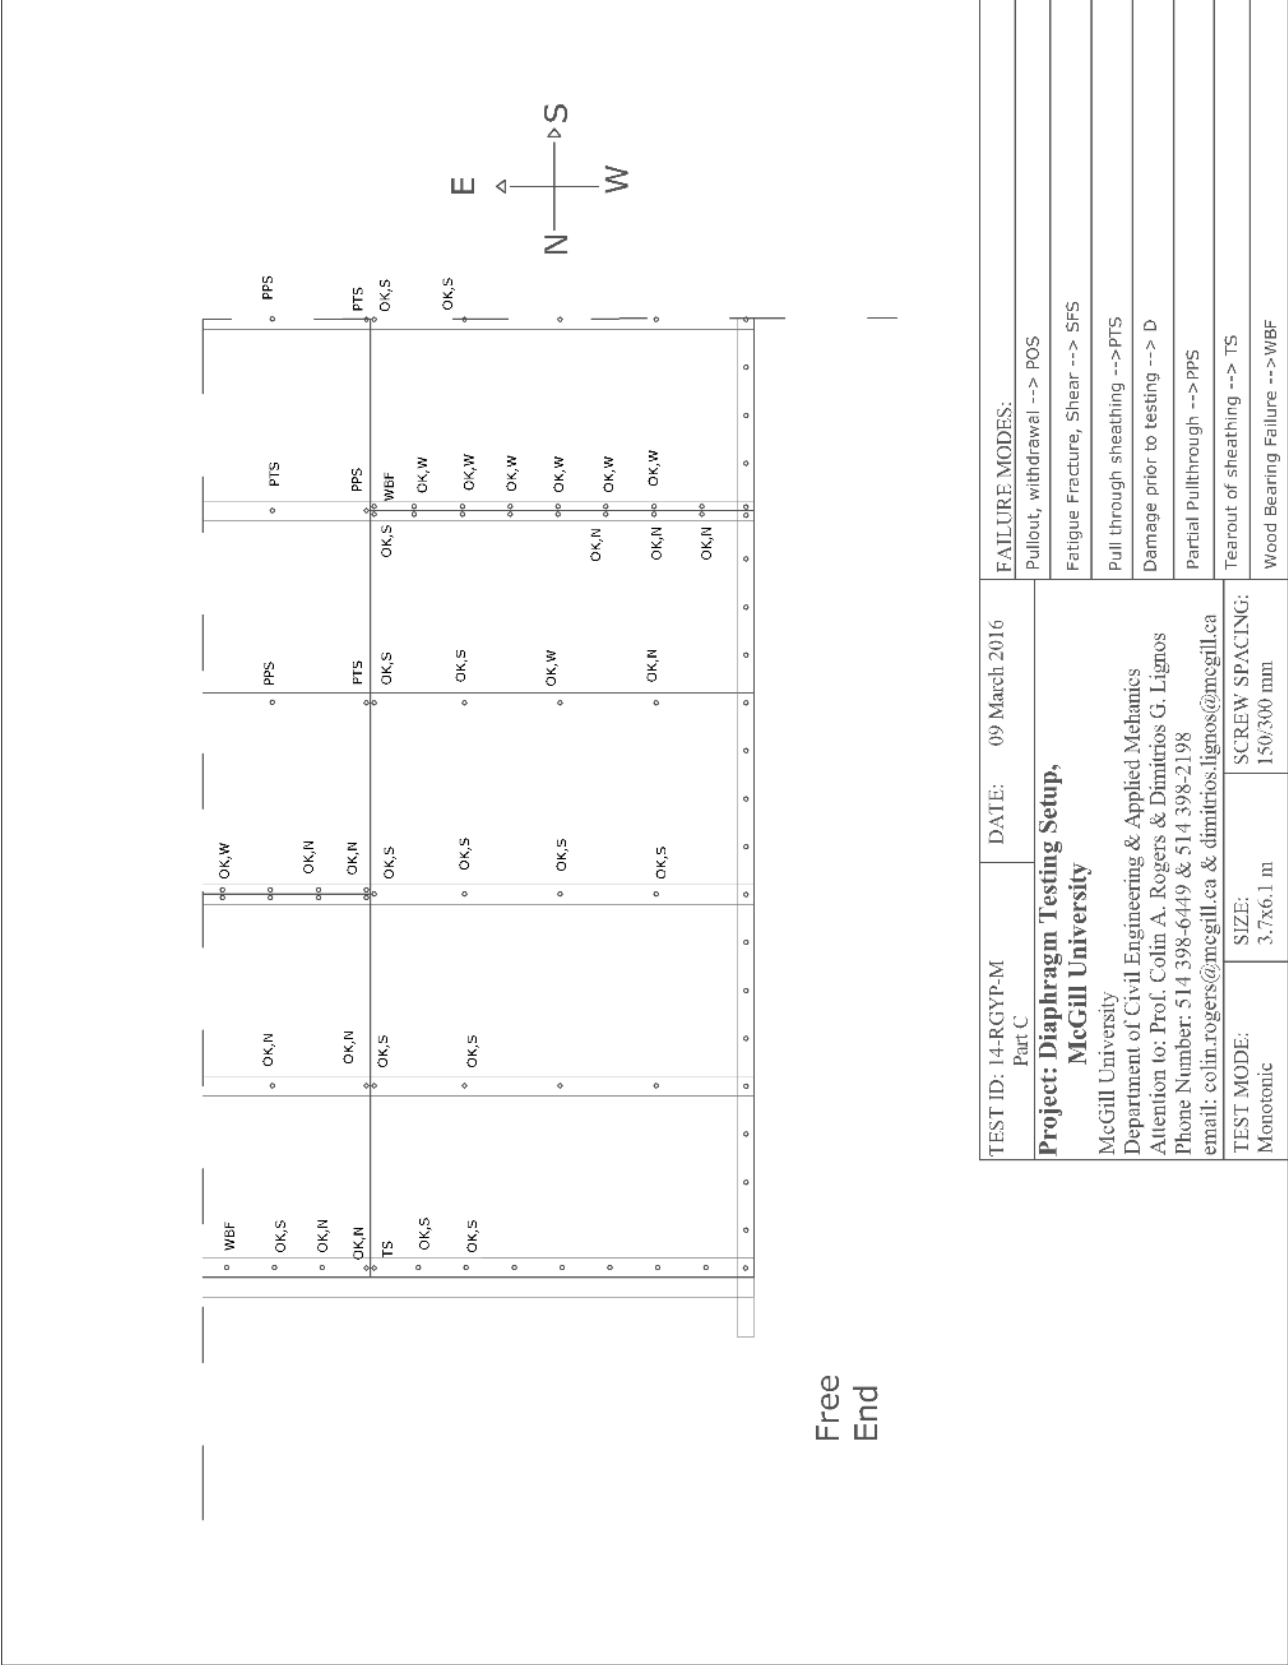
Sheathing Fastener Failure Modes Part C Specimen 14-RGYP-M
